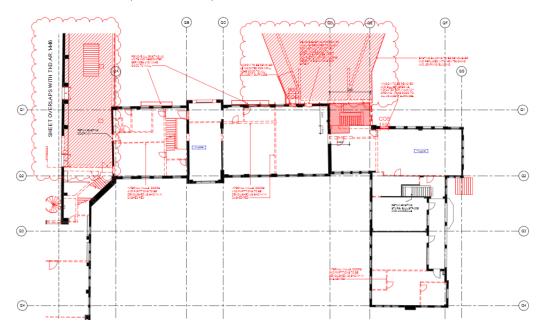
Extract from Demolition – Block 03 – Quadrangle Building L1 Floor Plan showing detailed breakdown of the proposed works to the Quadrangle building.
